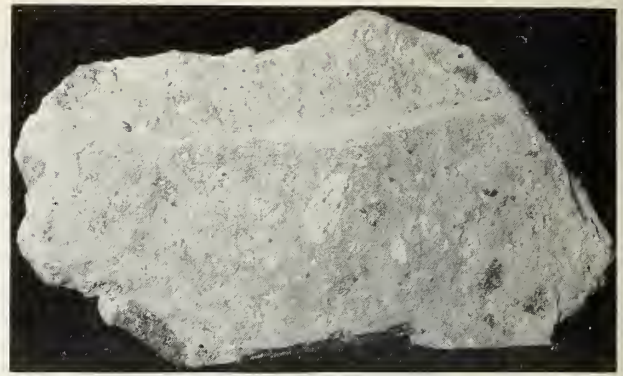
Sample of firebrick aggregate concrete spalled from top of furnace.
